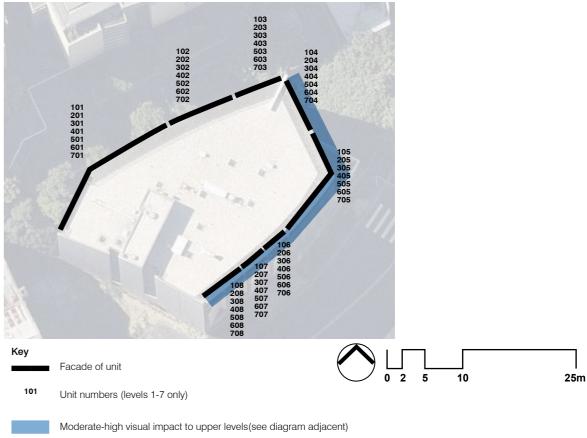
Architectus' understanding of unit layout of 2 Jones Bay Road and affected unit numbers for typical levels (1-7)
